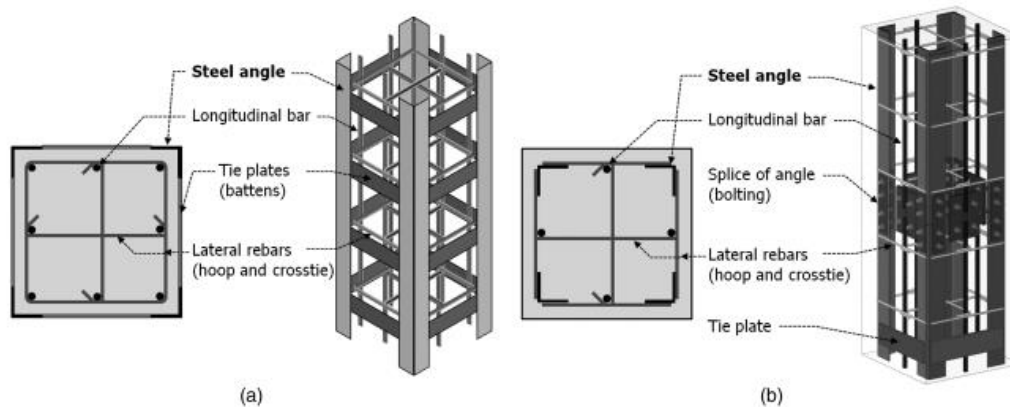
Composite columns using prefabricated steel angles: (a) existing method of retrofitting [data from Poon (1999), Montuori and Piluso (2009), and (Hwang, 2018)ione (2010)]; (b) proposed PSRC composite column (Eom et al. (2014))
